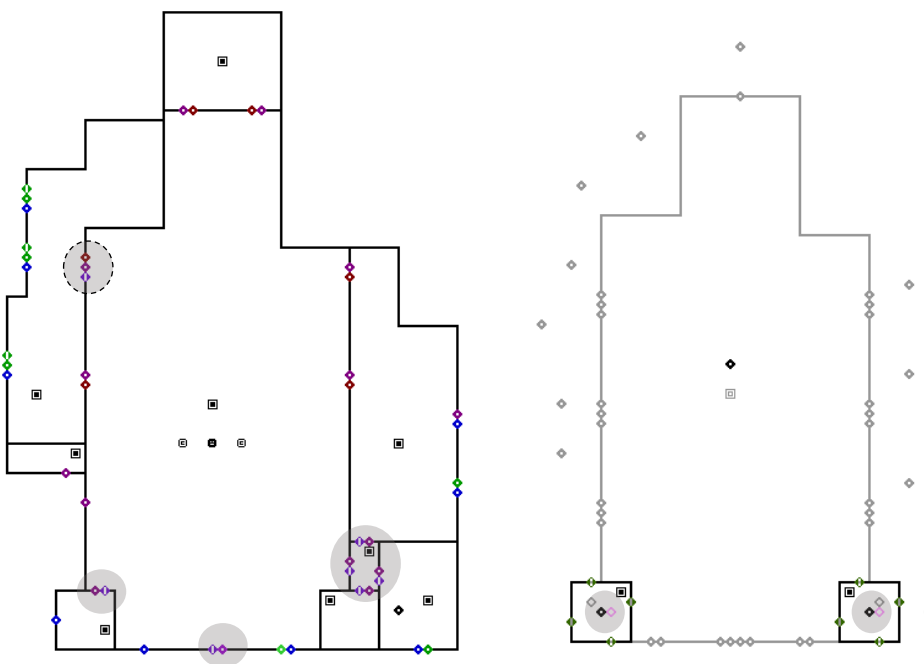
Sim\_2*: 1<sup>st</sup> floor and 4<sup>th</sup> floor open span schematic (light grey walls and airflow paths represent the floor below)
